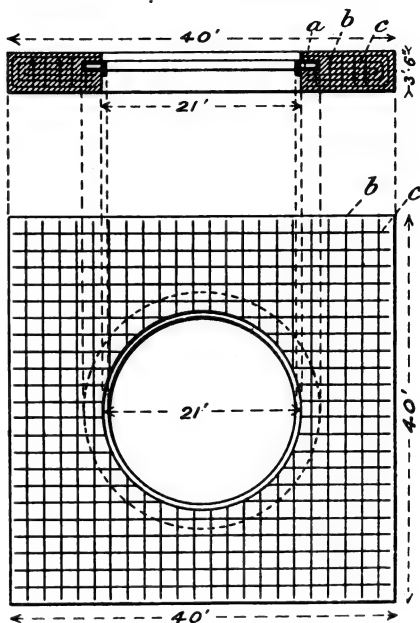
Reinforced Concrete Block for holding Anchor Ring. (a) Anchor Ring; (b) and (c) Iron Reinforcing Bars.
